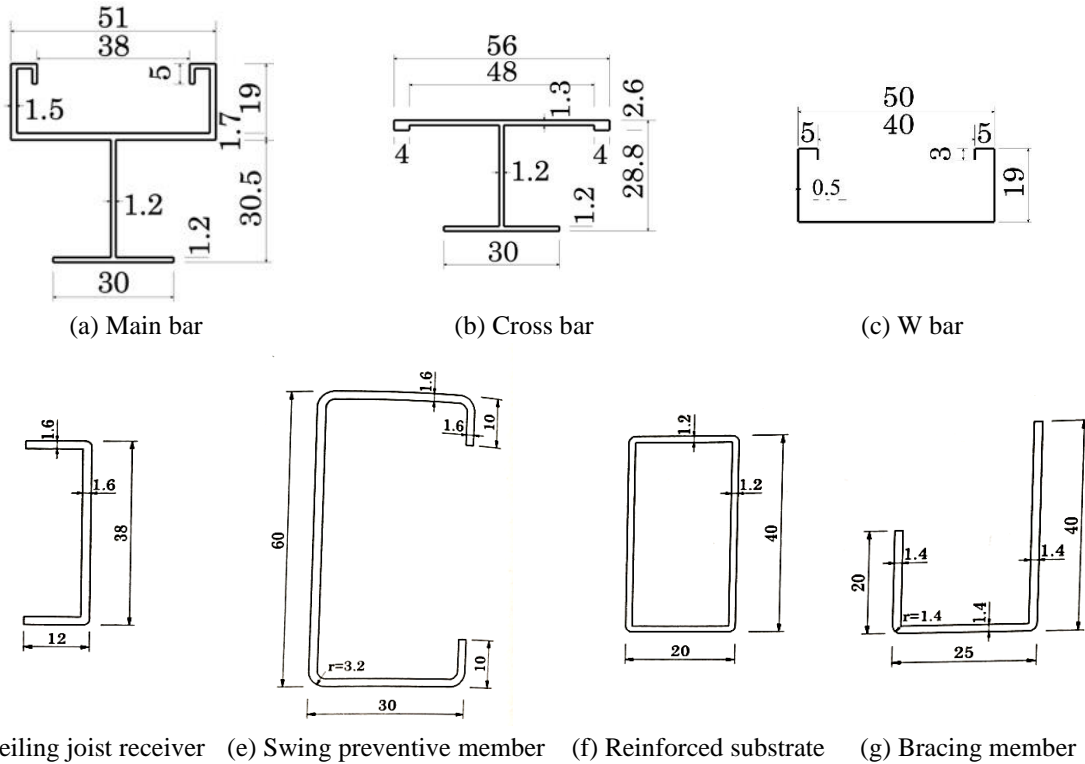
Ceiling substrates of a suspended ceiling (dimension: mm)
